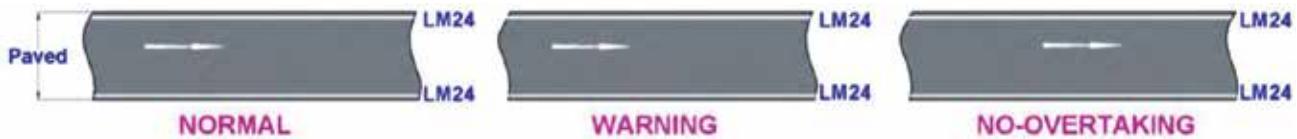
Single/Intermediate Lane Ramp/Slip Road/One Way Street (Paved Width upto 5.5 m)
